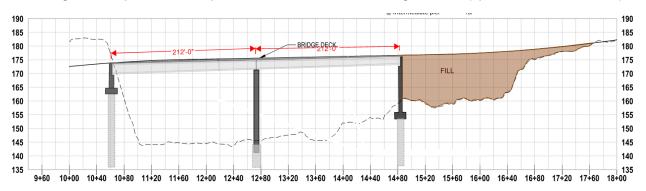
Option 4 - Two-Span Girder Bridge Elevation (Spans: 212 and 212 feet)
